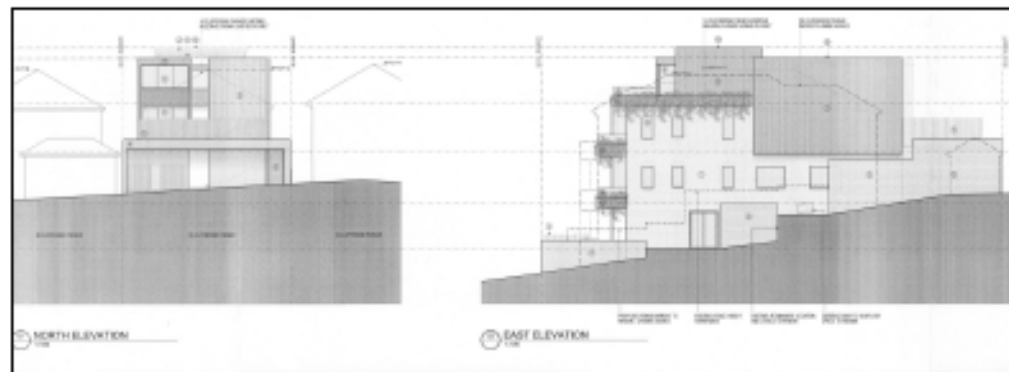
Excerpt of approved elevations to No. 18 Cliffbrook Parade (DA/601/2012)
